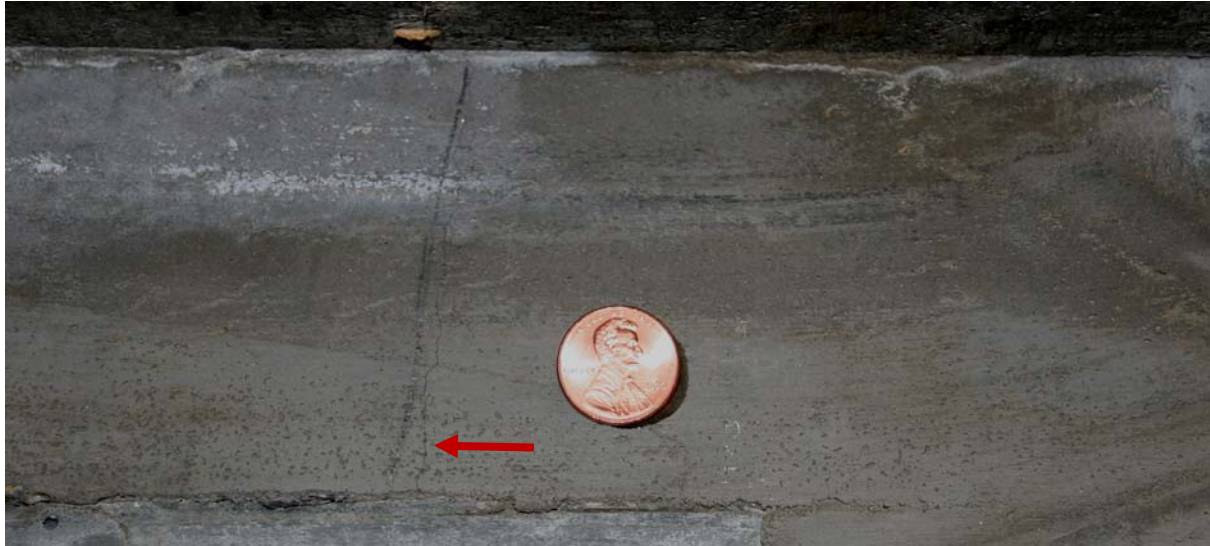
Photo. Shrinkage crack in haunch on north face near west end of conventional grout test specimen.
